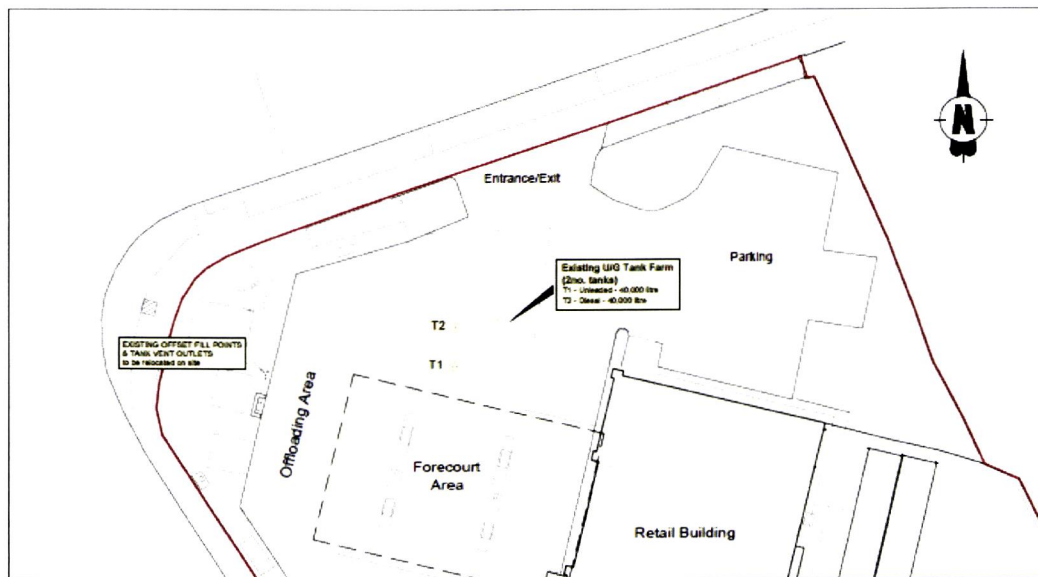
Extract from site layout plan prepared by JA Gorman Consulting Engineers showing location of existing tanks.
